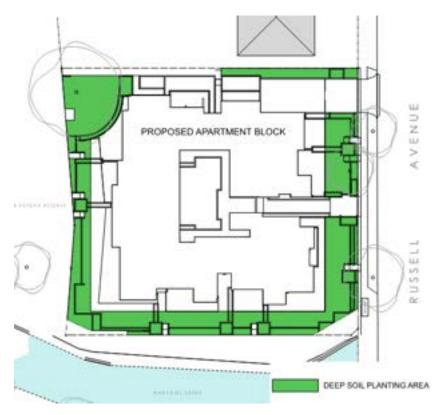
Site plan illustrating quantum and indicative location of deep soil zones
